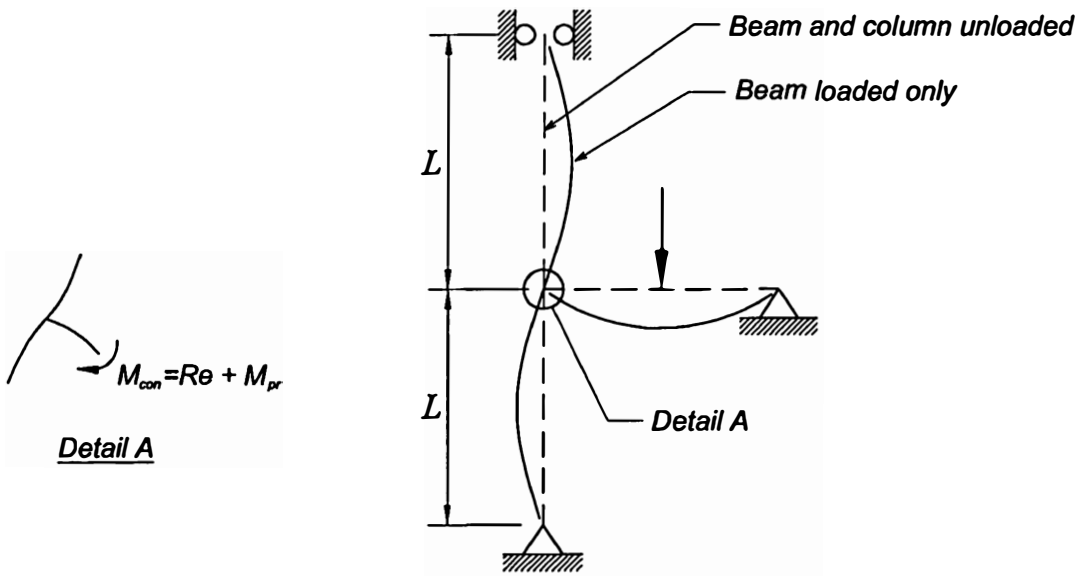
Illustration of beam, column and connection behavior under loading of beam only.
